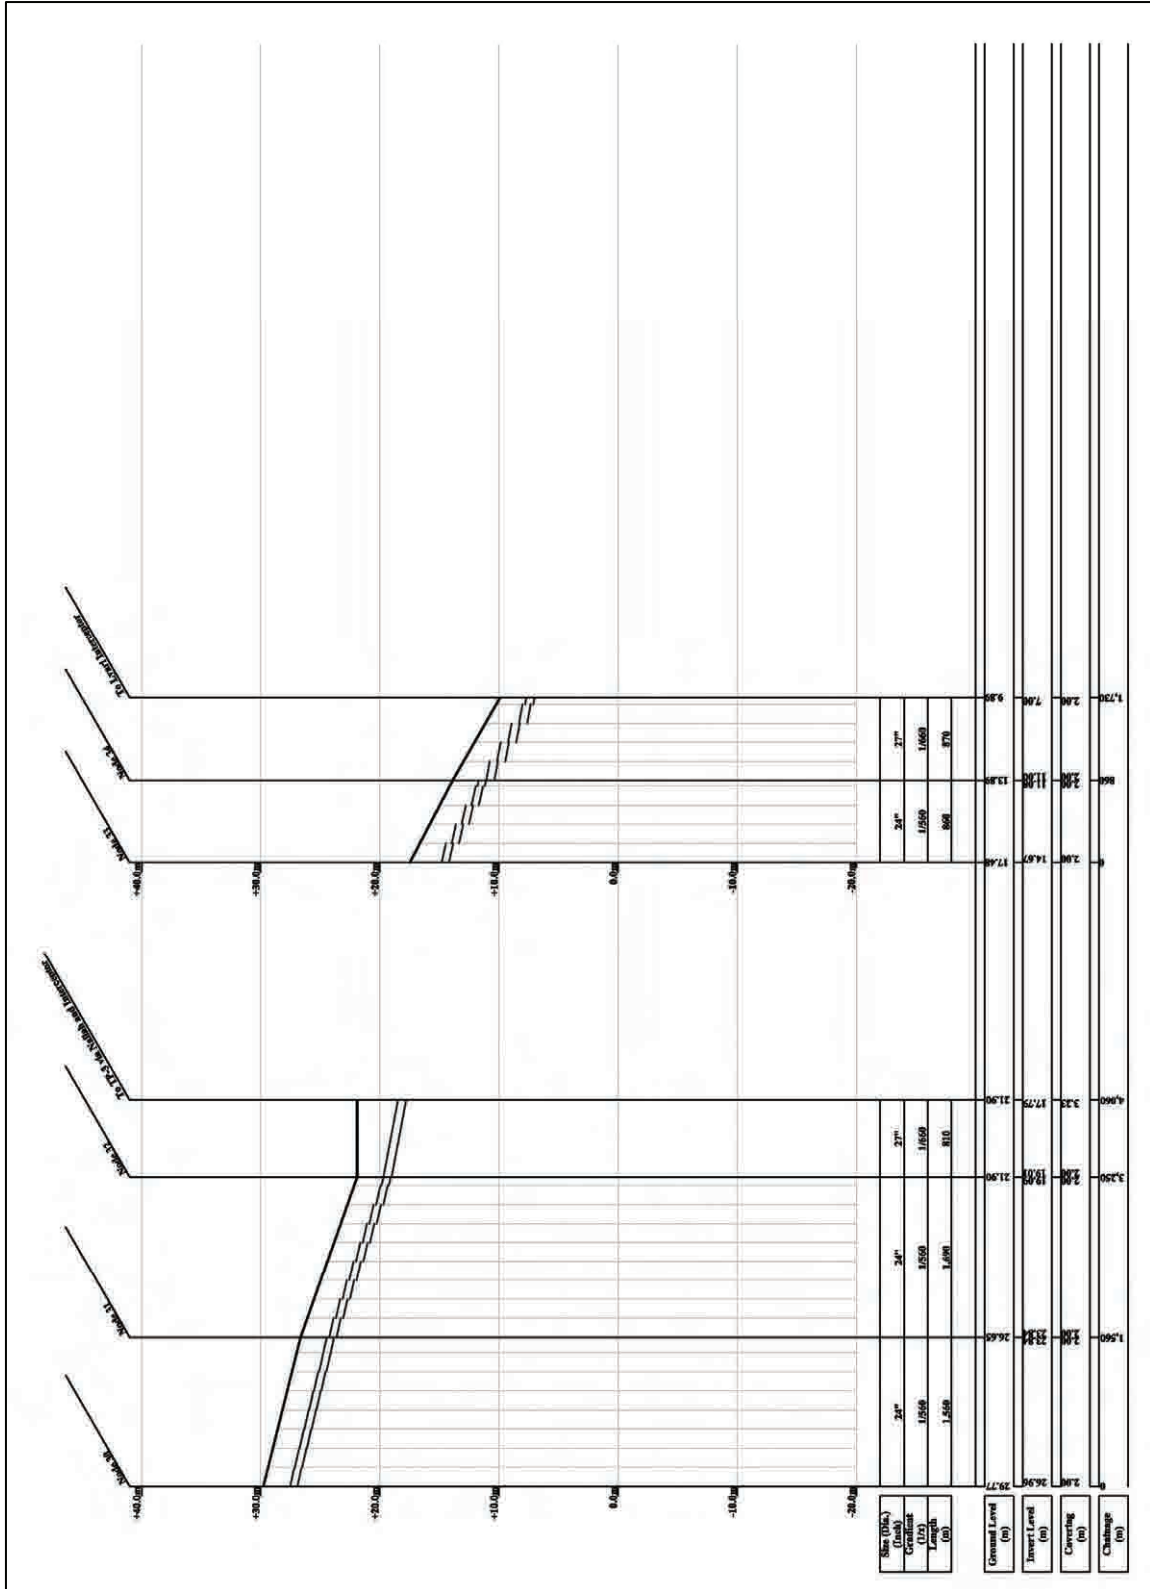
Longitudinal Section of Trunk Sewer and Sub-main Sewer (4/4)
